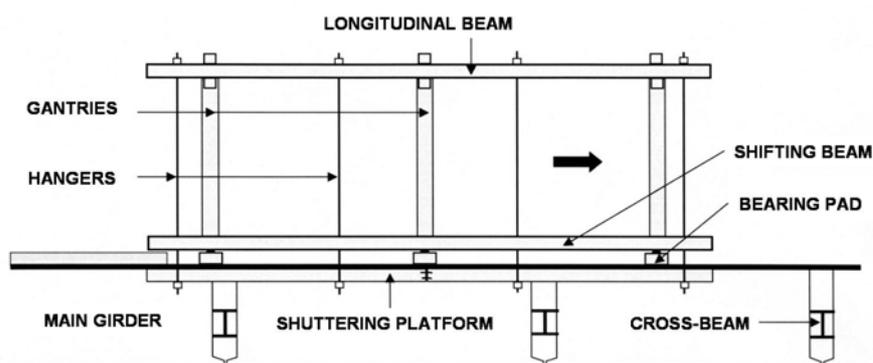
Longitudinal view of mobile formwork for a twin girder cross-beam deck (reinforcement for casting section under construction not shown)
